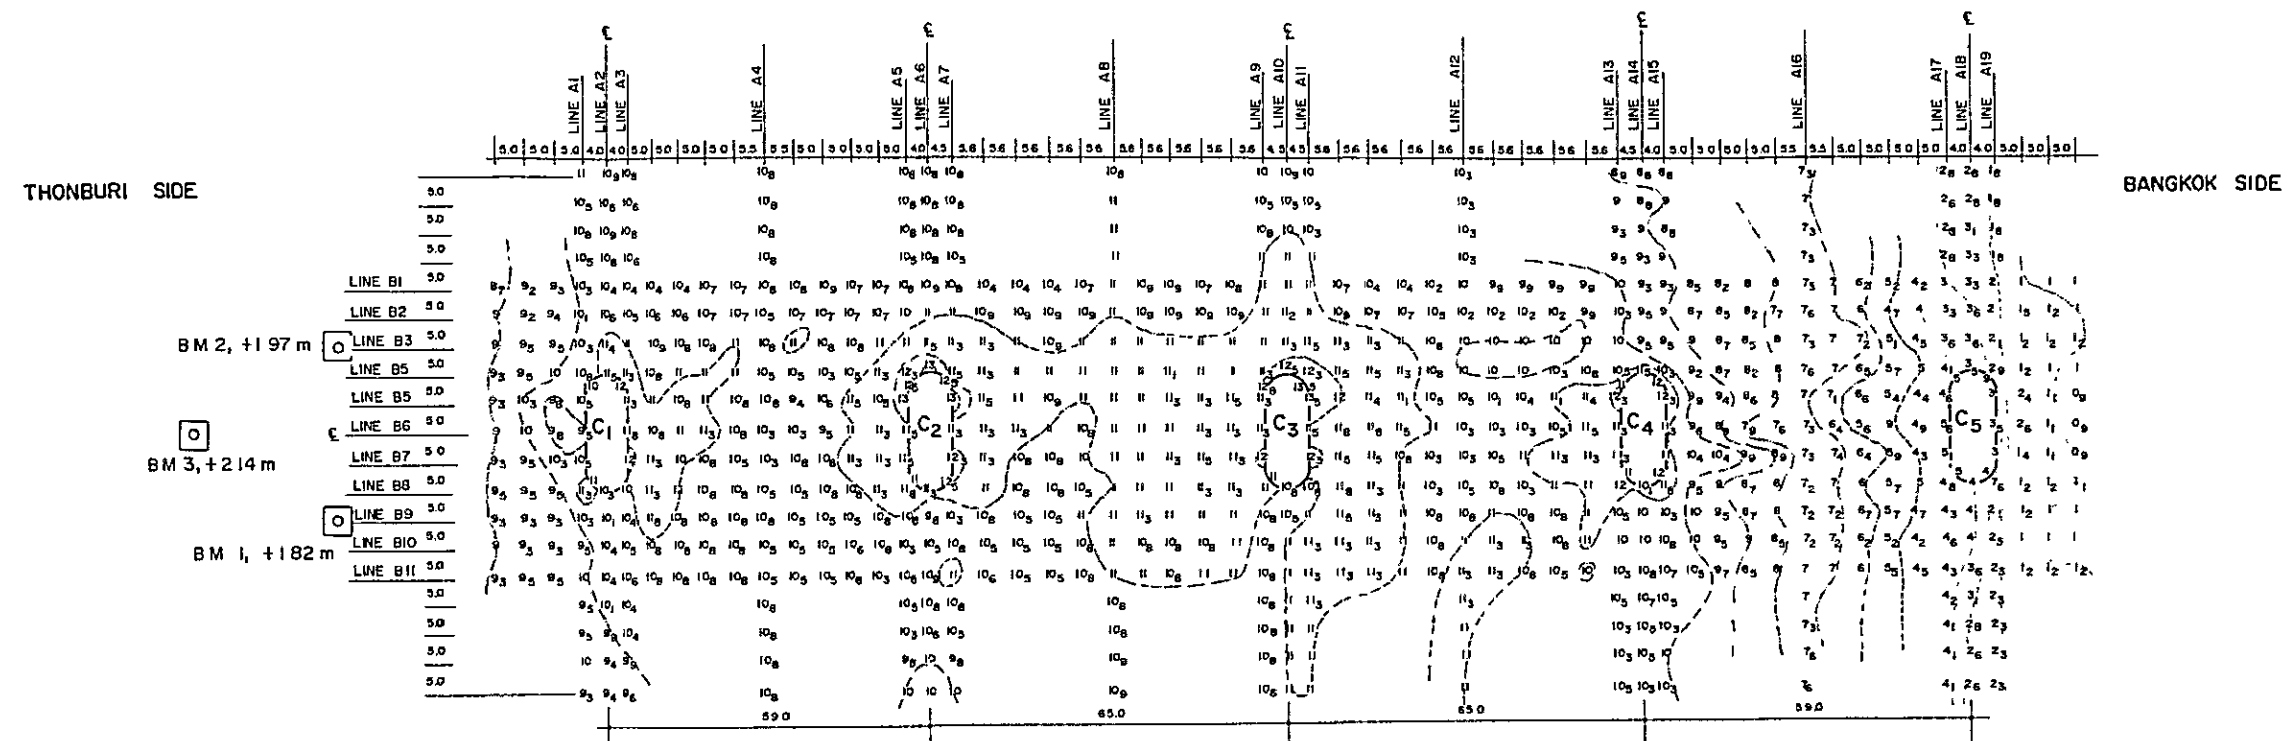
THE EXISTING SUBSTRUCTURE OF THE MAIN BRIDGE
